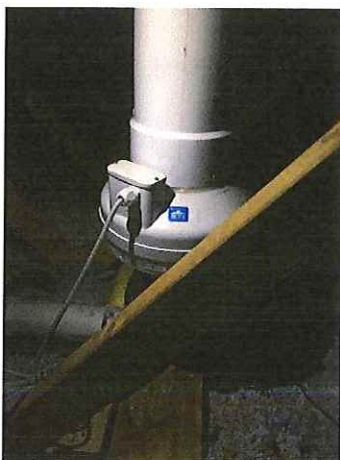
SSDS System Fan and Permanent Electrical Connection.
